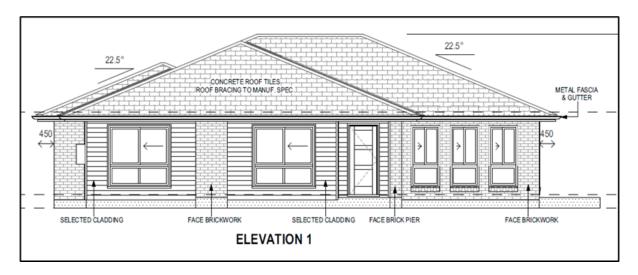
Elevation of Proposed Unit 5 from Eaglesfield Street
